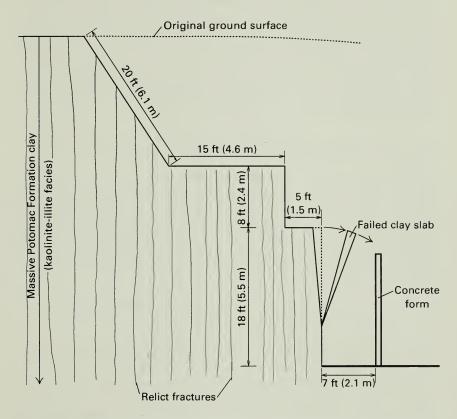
Schematic cross section of excavation at Greenbelt, Md., showing part of a wall that failed (after Withington, 1964).
